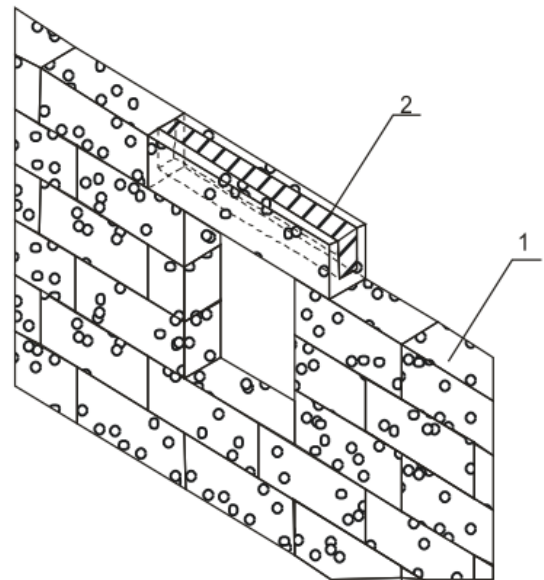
Precast-monolithic jumper from the gutter blocks 1 — wall twinblocks; 2 — reinforced concrete
